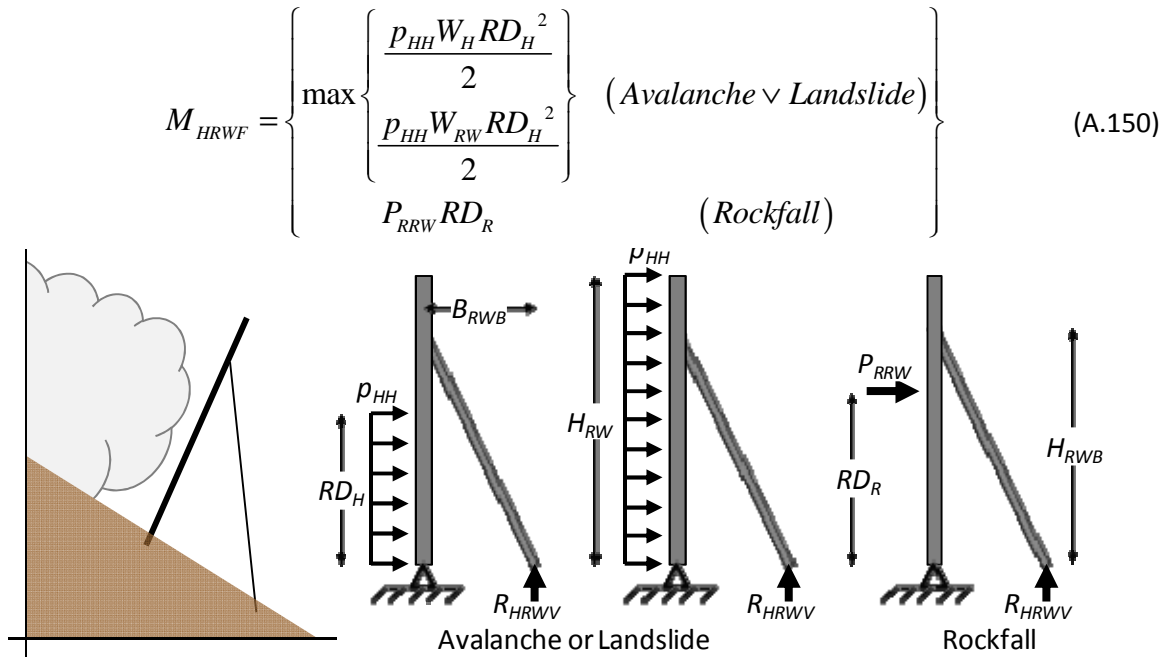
Assessing the retaining wall foundation to the applied mass movement or rockfall hazard.
